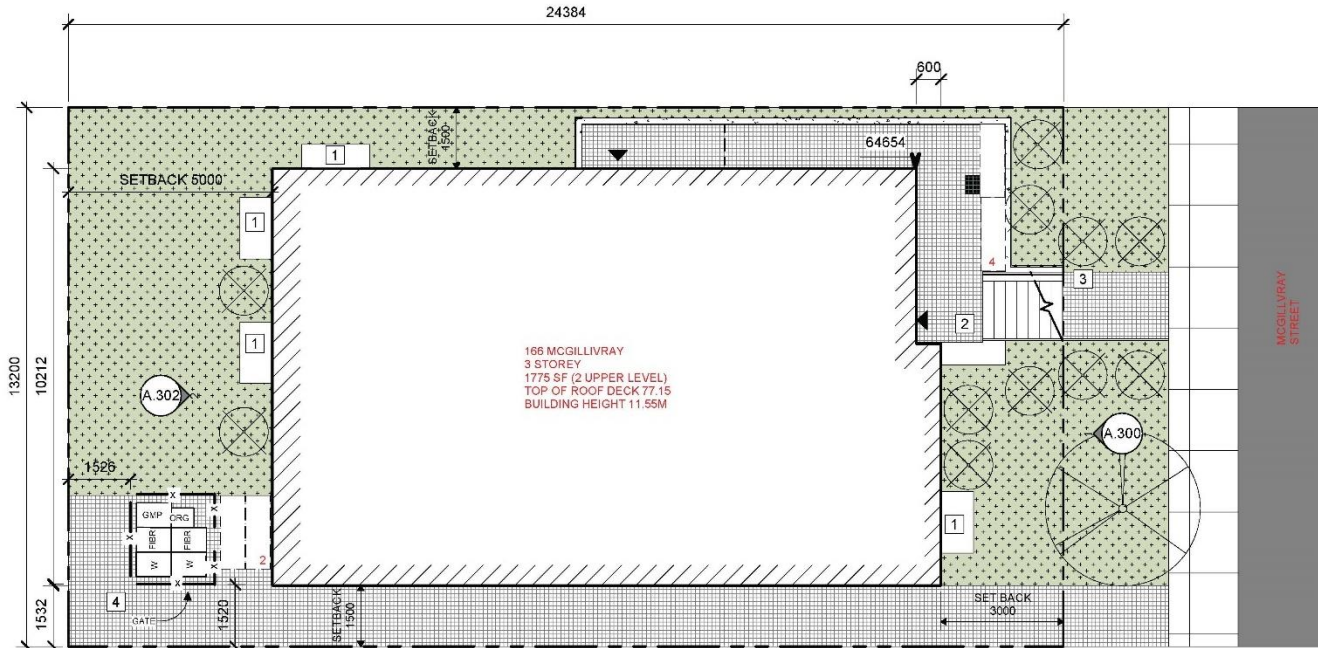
Site plan of proposed development on 166 McGillivray Street, prepared by CSV Architects
